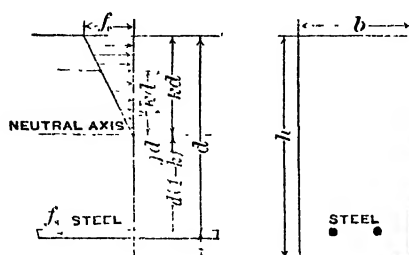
Resisting Forces in a Reinforced Concrete Beam.
